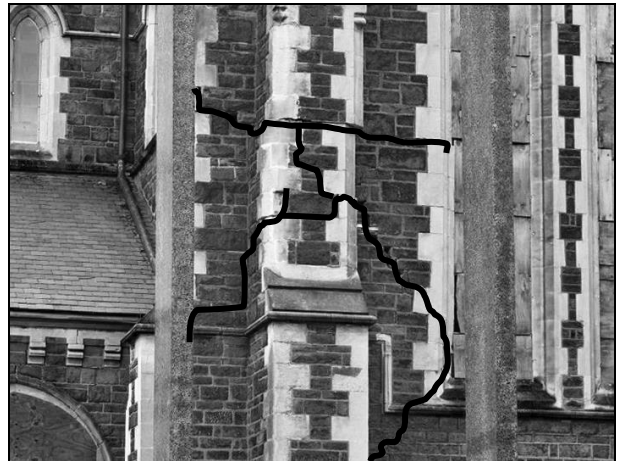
Cathedral Church of Christ (1864), Christchurch. 3 leaf basalt (from Banks Peninsula) wall and limestone ornamentation. In-plane failure shown by diagonal cracking (highlighted for clarity) and twisting of the buttress.
